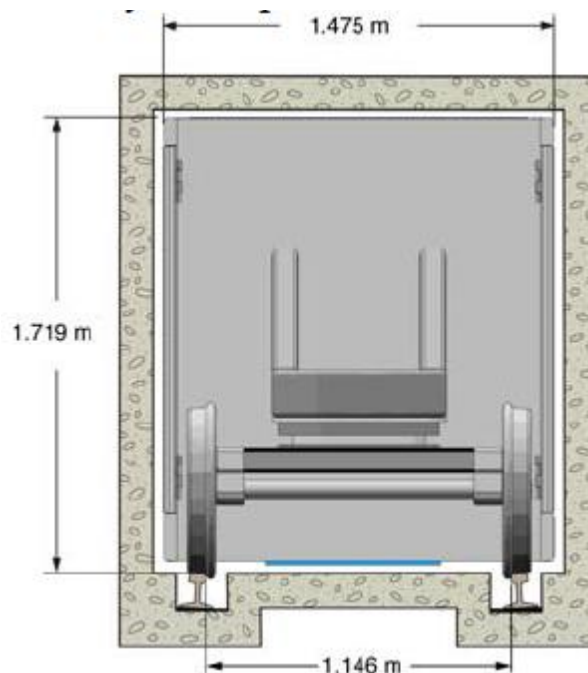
Cross-sectional view and key dimensions of capsules, Liu and Lenau (2009)
